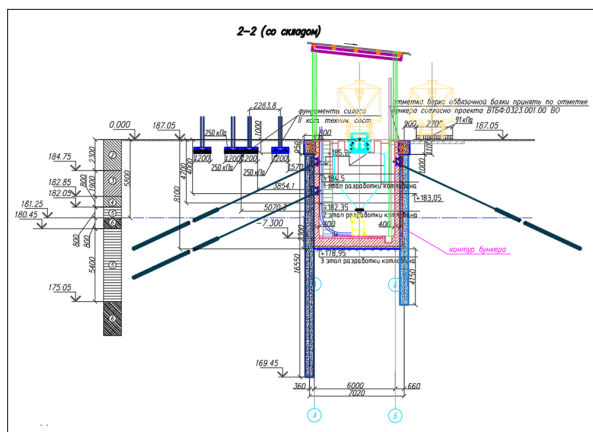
Scheme of vertical binding of buried retaining structures of the construction pit
